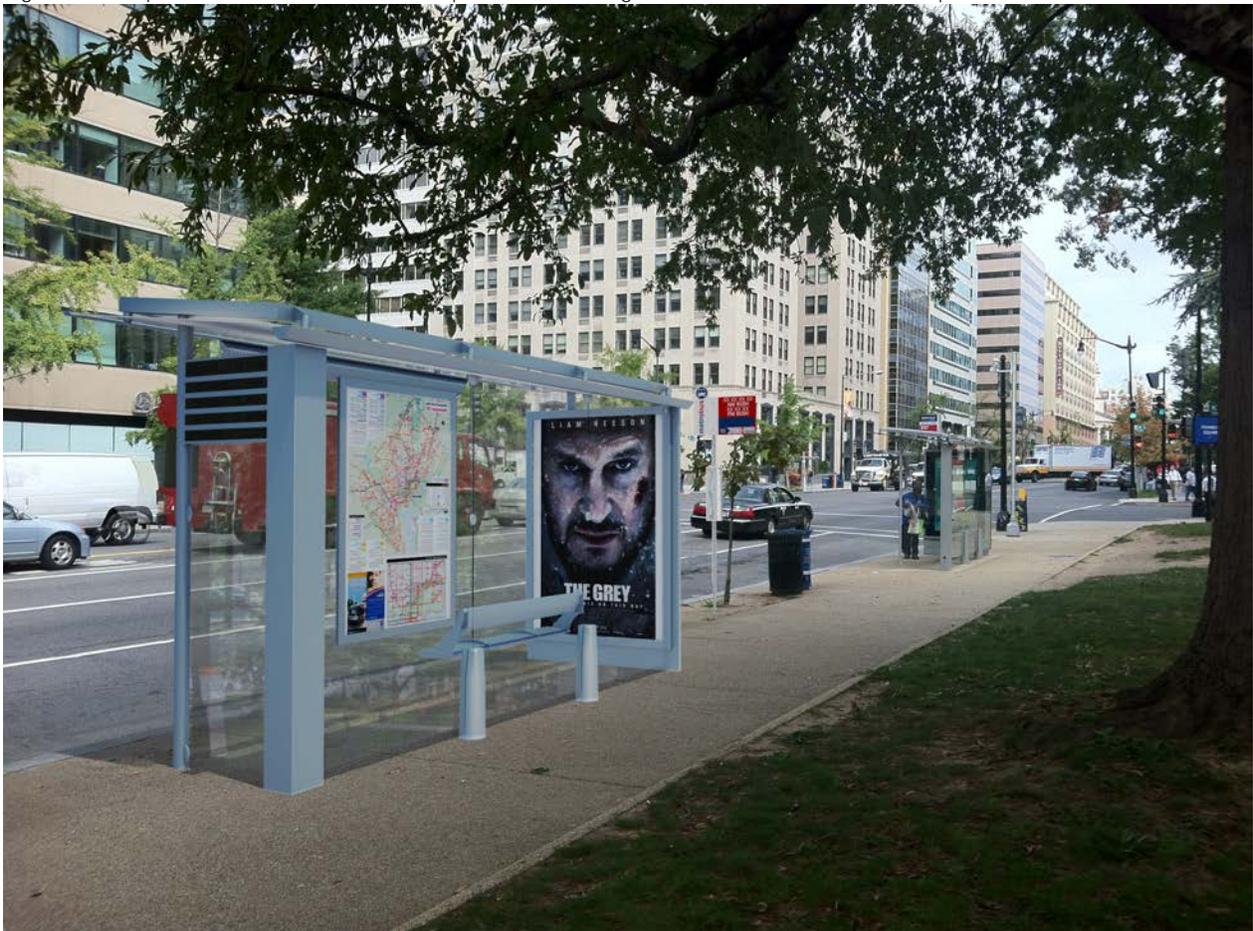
Proposed Curb Extension and Shelter Configuration on I Street NW
